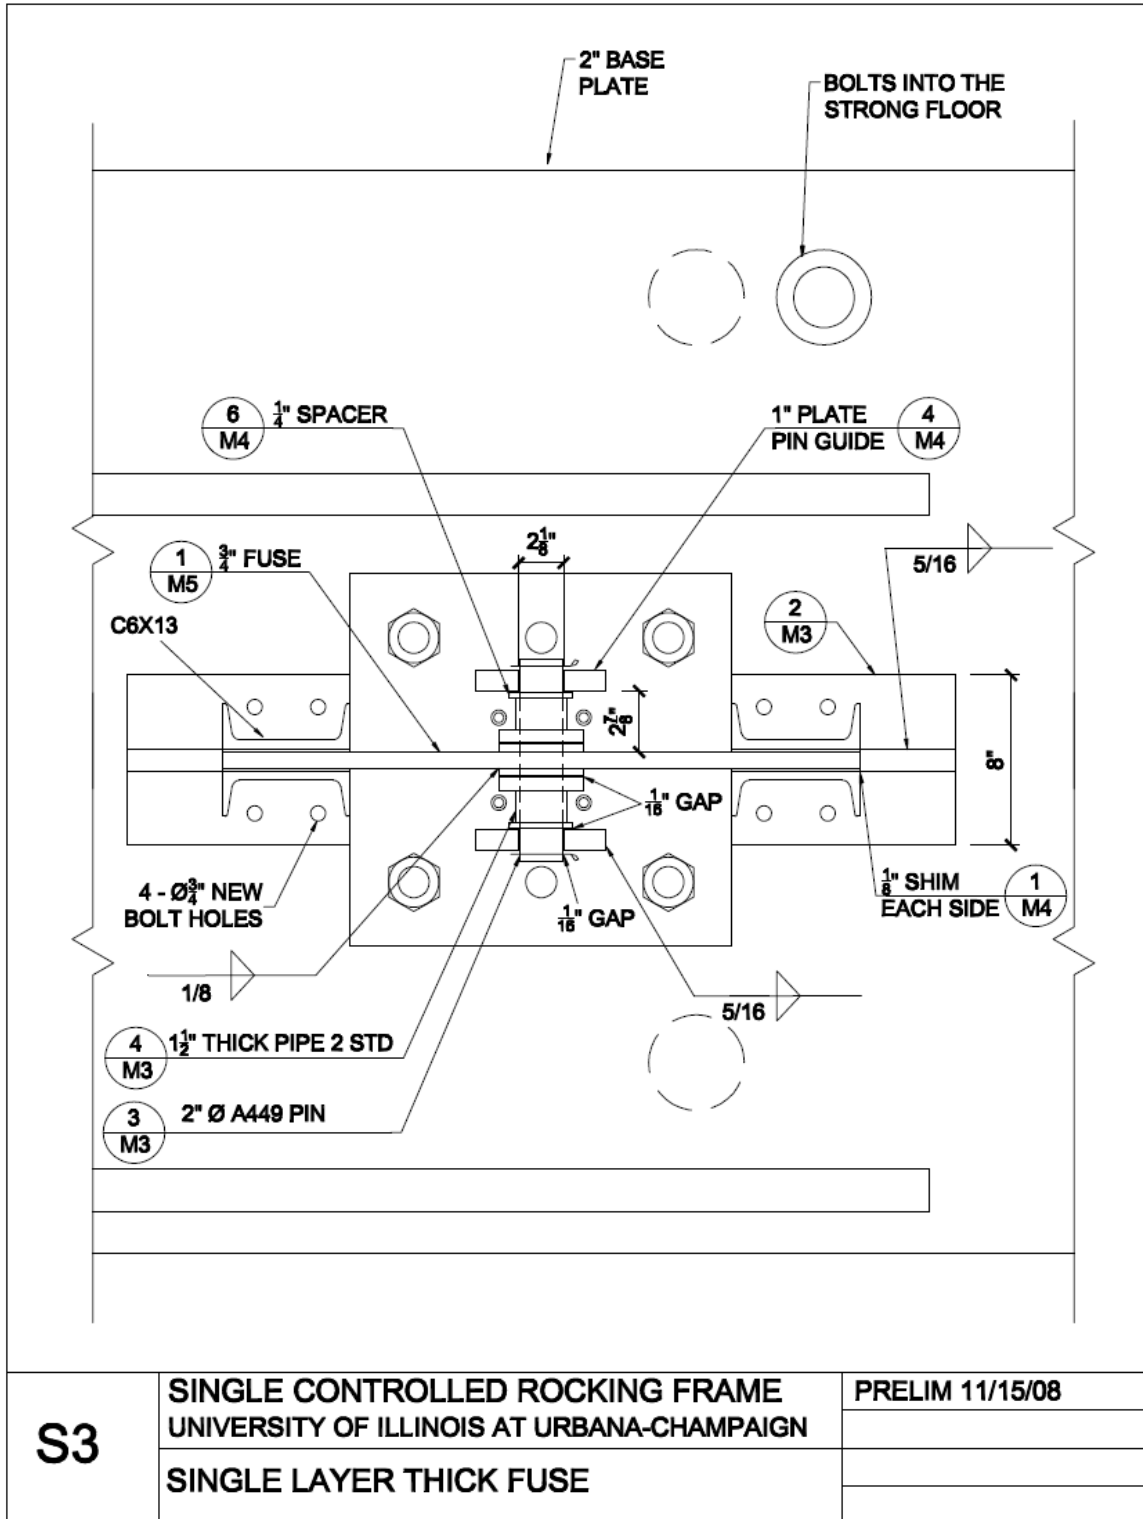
Design Drawing for the Single Frame Configuration – Specimen B1 Plan
